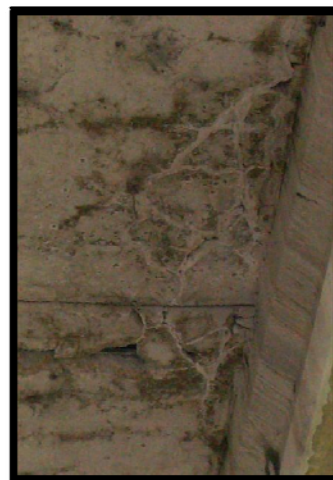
Bridge No. 100436, Span 4 Failure (Deck Underside)
